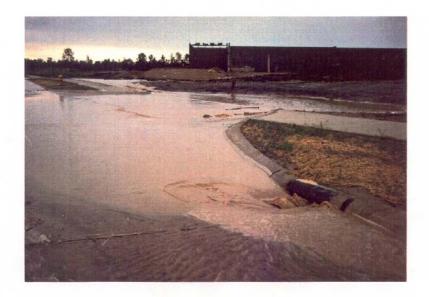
Sediment laden water entering storm drains on the construction site.
